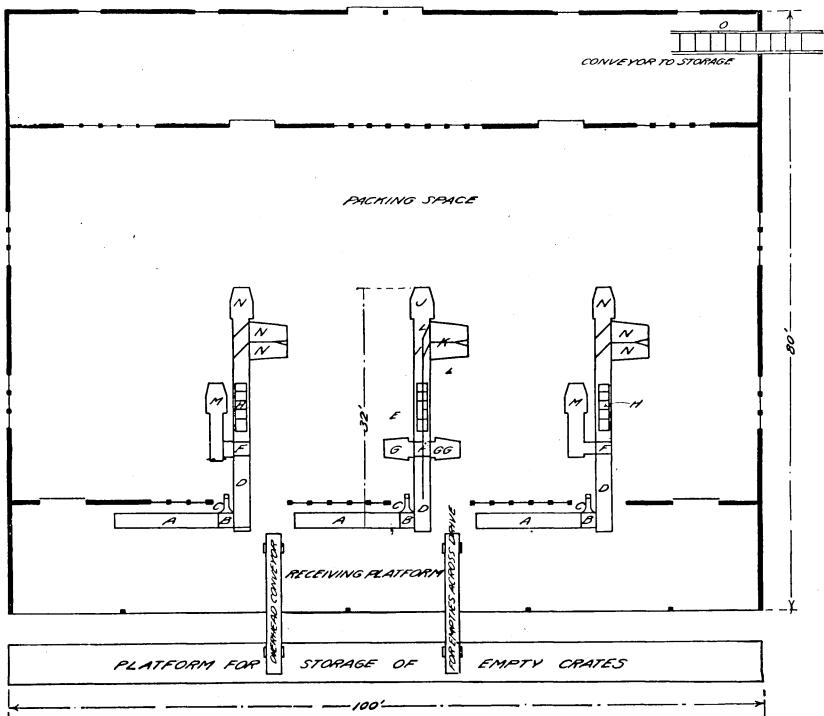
Plan 2: Floor plan for a community packing house with a capacity of 1,200 barrels a day.
